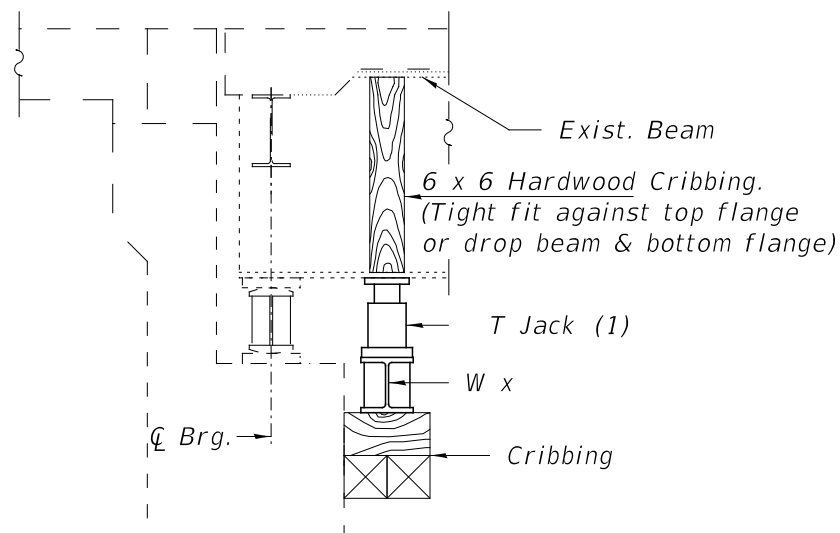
Jacking/Shoring and Cribbing System Pier
